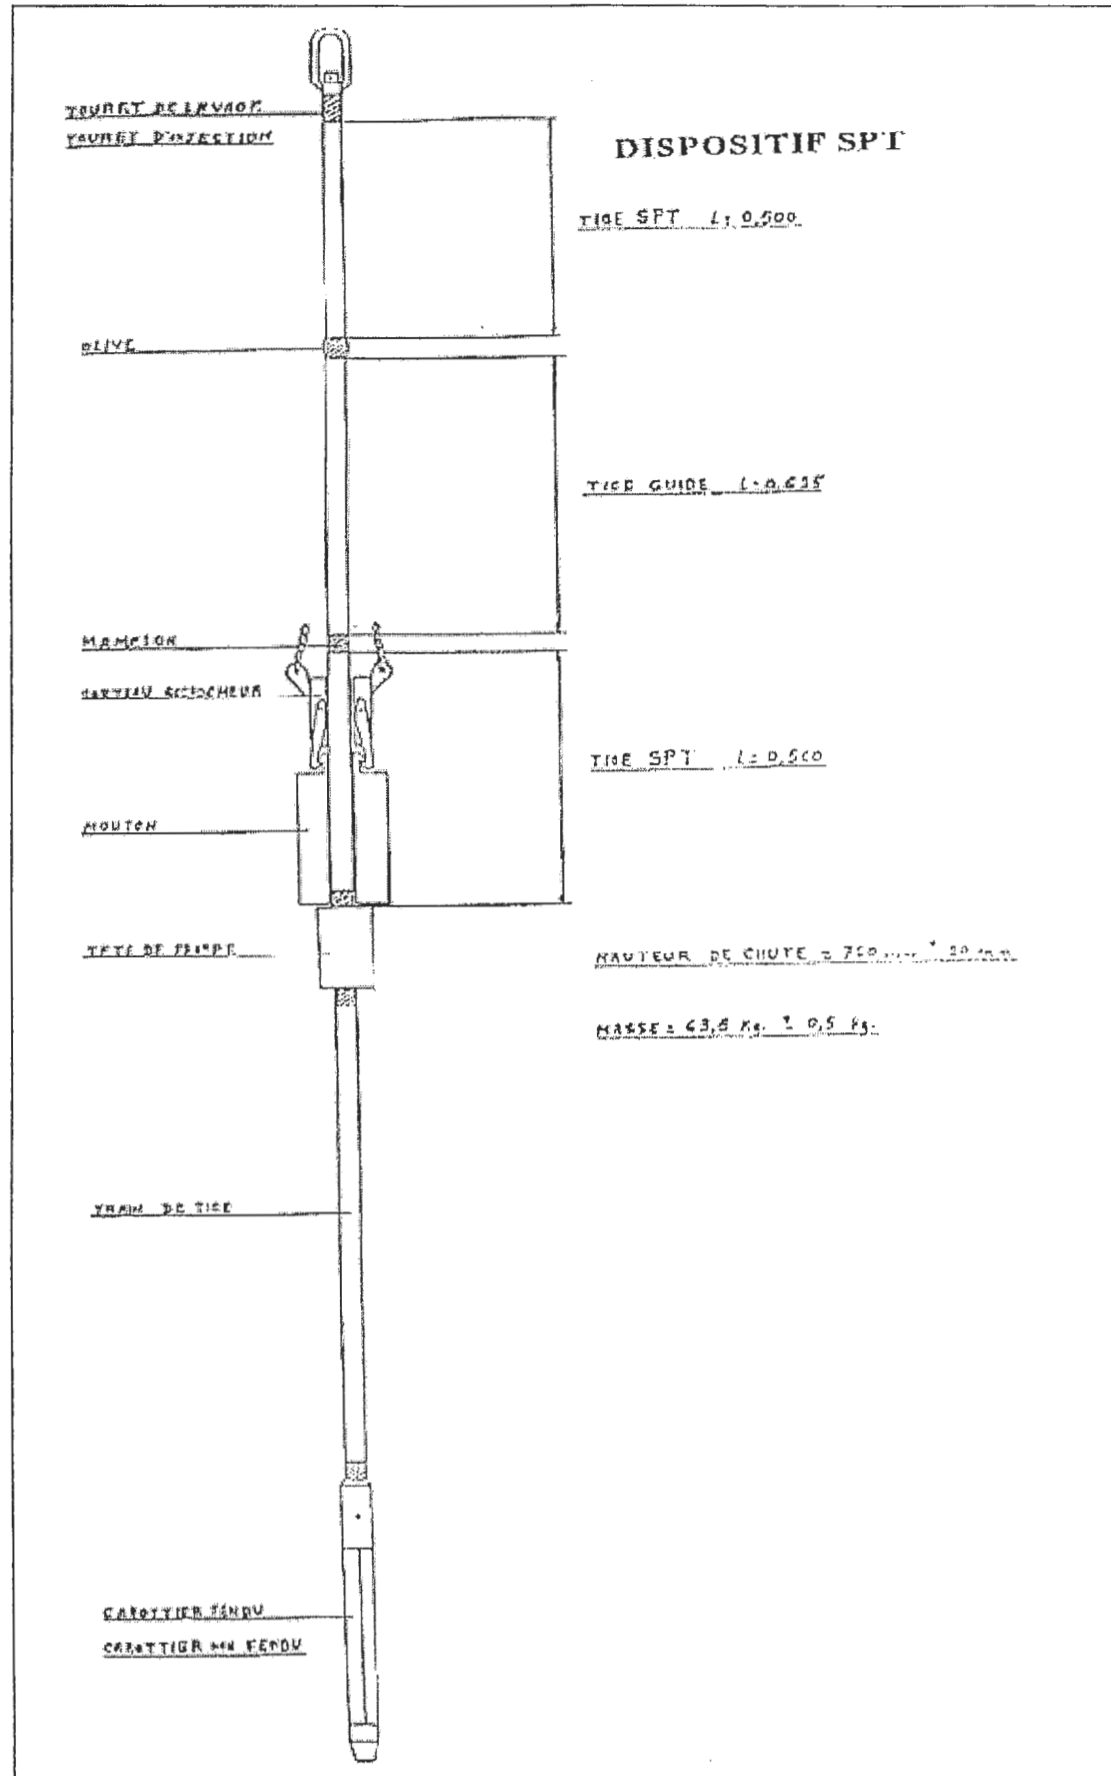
Standard Penetration Test in (FONDASOIL)
